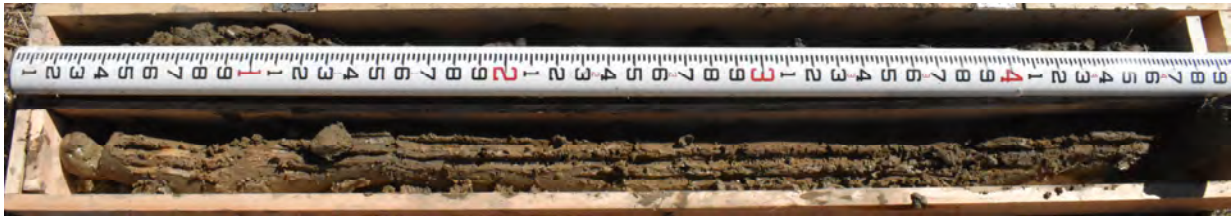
Boring SB-2 from depth 15 to 17 feet below ground surface
